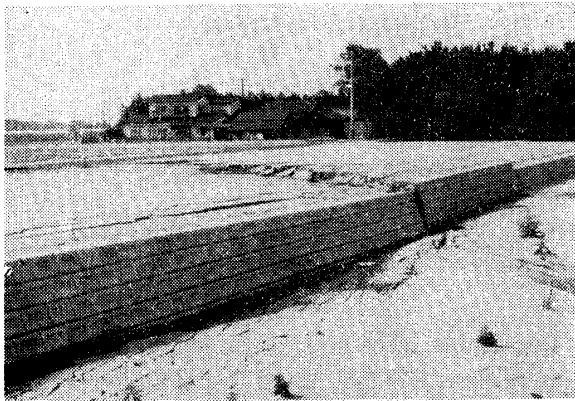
Cracked and subsided ground at a recently filled residential quarter (Site A-2)
